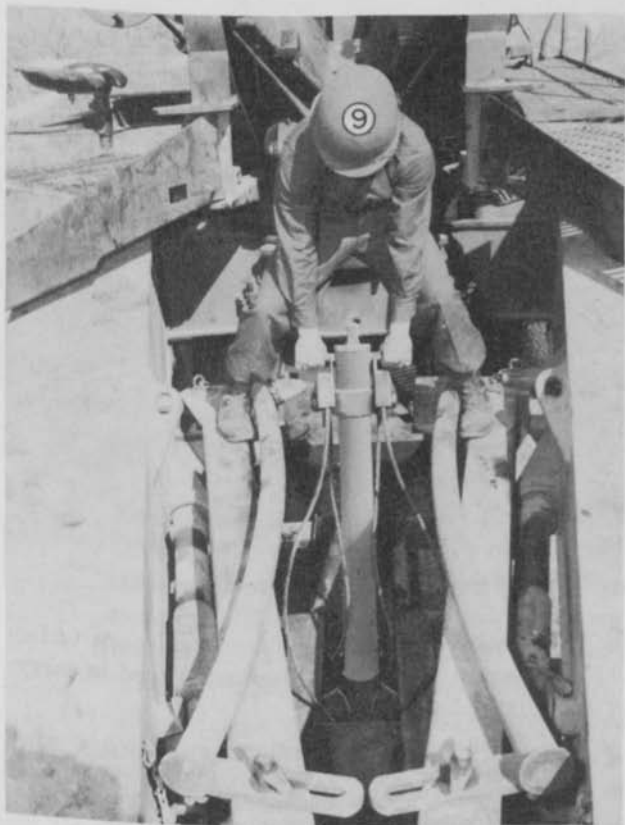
Lifting tube with screw jack and lifting saddle.
